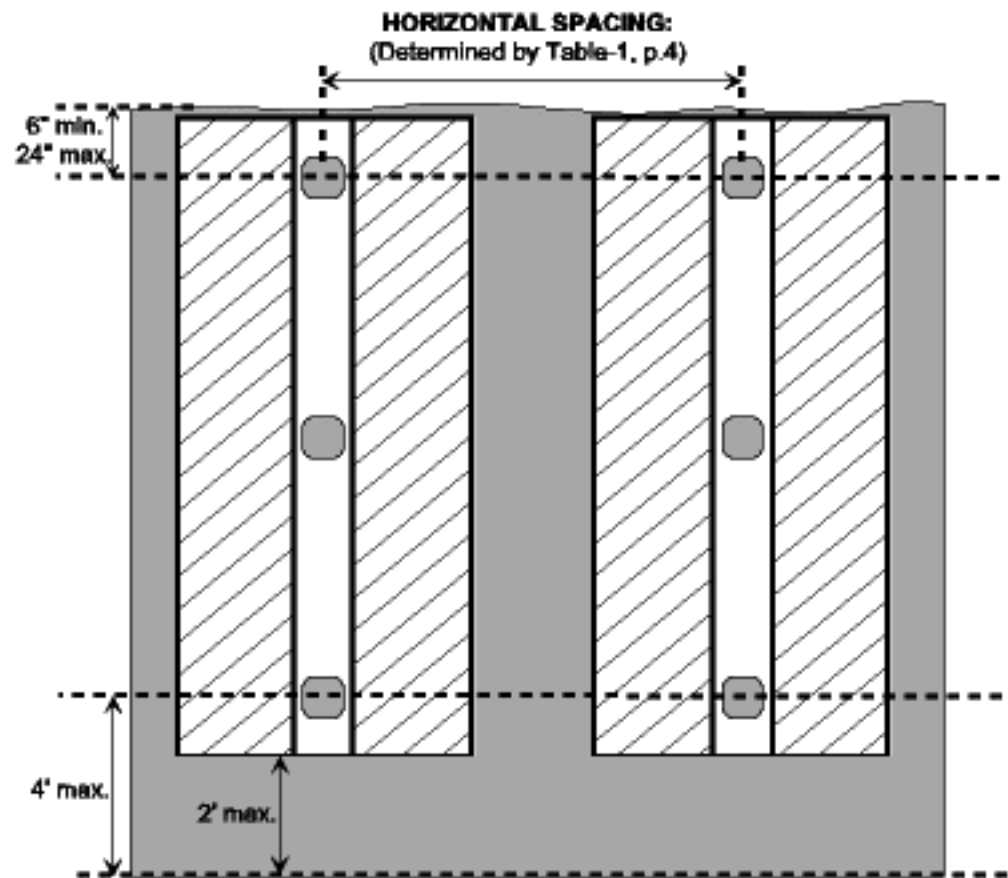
Allowable placement of uprights and sheeting in trenches where plywood sheeting is required
